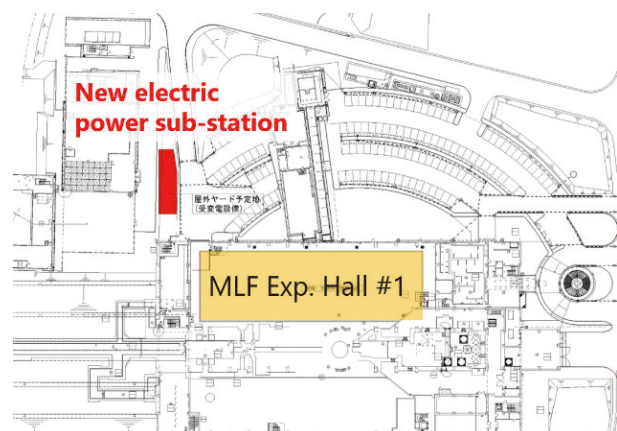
Construction site of a new electric power sub-station. It is located outside the MLF building.
